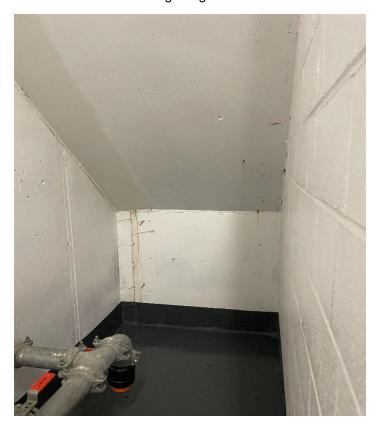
Photo of the concrete slab in a mechanical room of the Site's cellar.
